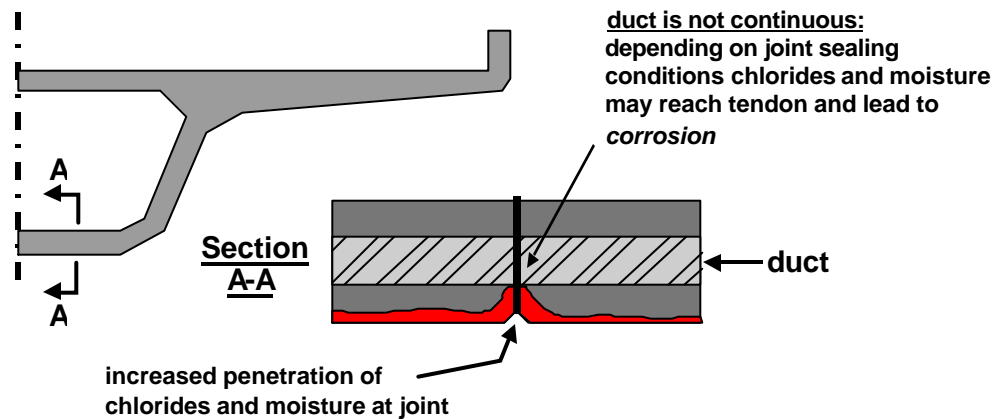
Possible Corrosion Mechanism at Precast Segmental Joints.¹⁵
